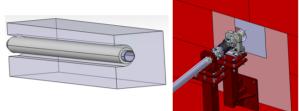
Tunnel wall break through. Left casted mono block concrete filler with beam tube (surrounded with insulation for bake out). Right: Situation.
